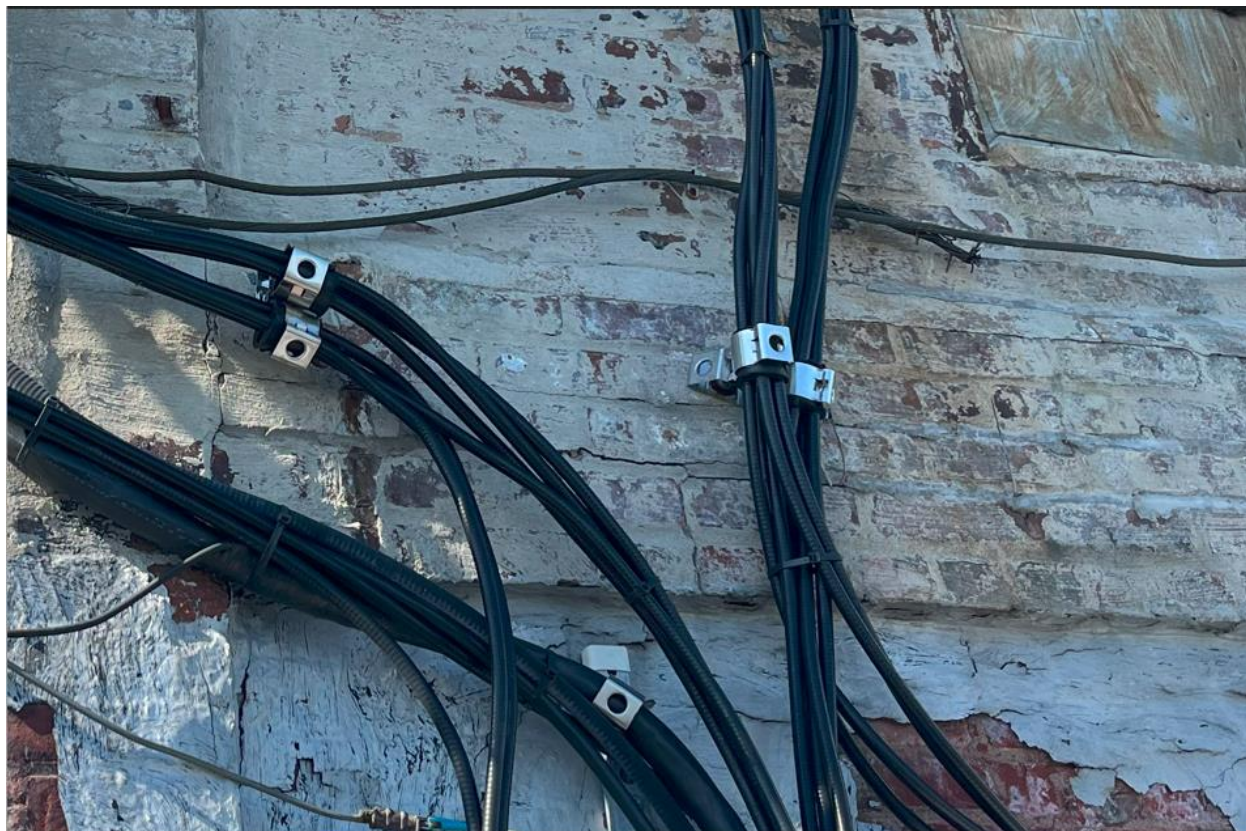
Horizontal cracks with slight shift in bricks forming along bulkhead SW exterior cable tray wall.
